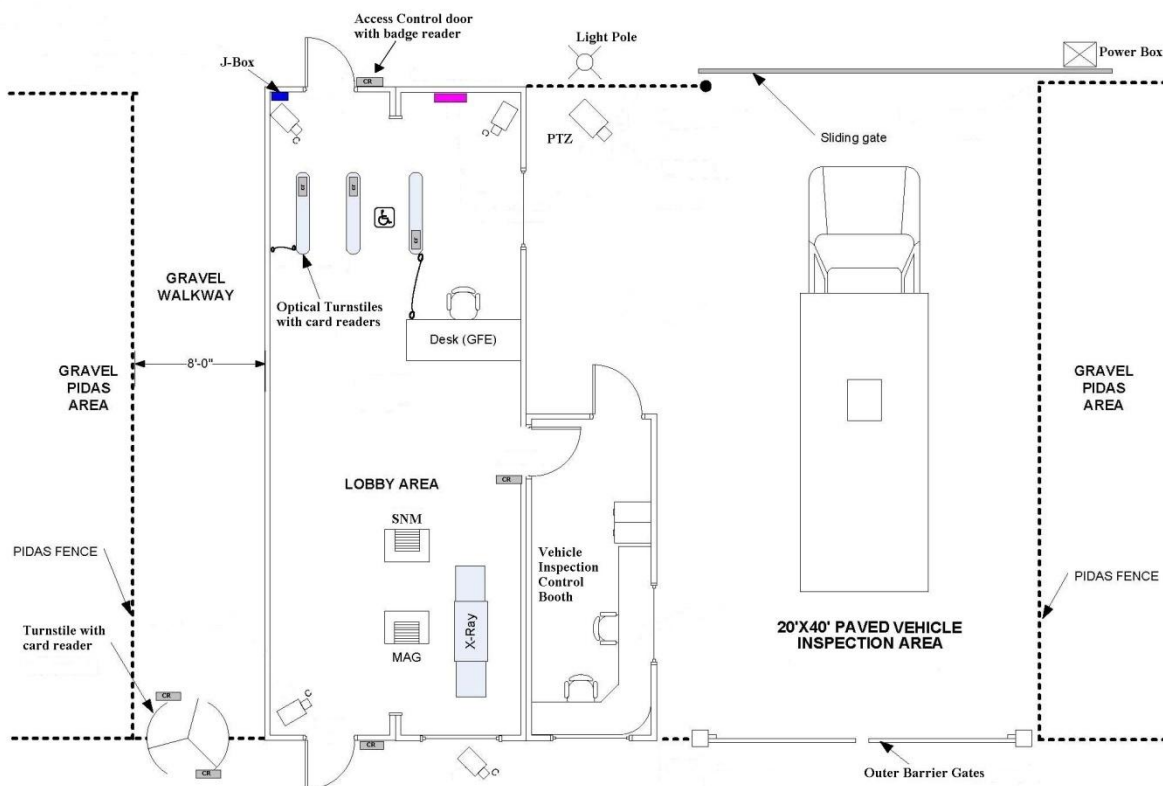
Floor Plan for Building 9825I, Simulated Entry Control Facility
